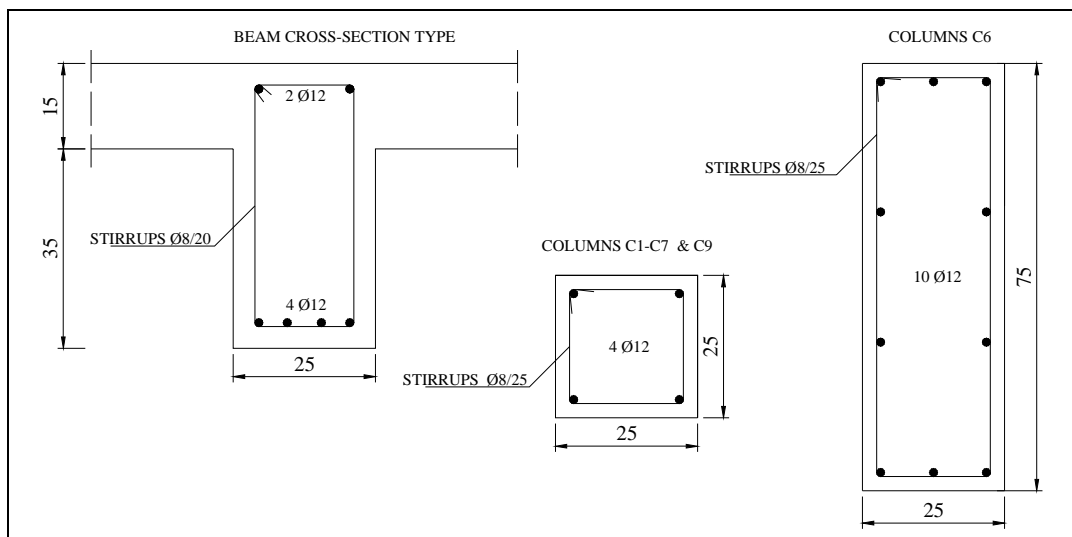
Typical beam and column cross-sections, dimension in cm.
